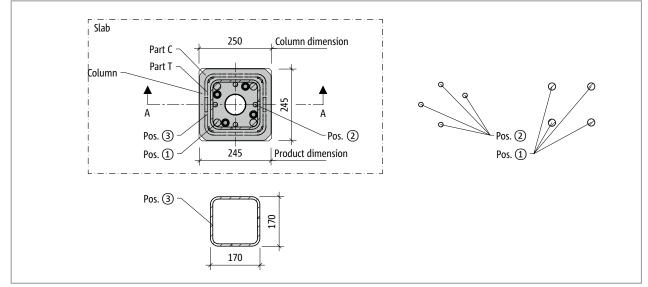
Schöck Sconnex® type P: On-site reinforcement in column cross-section
